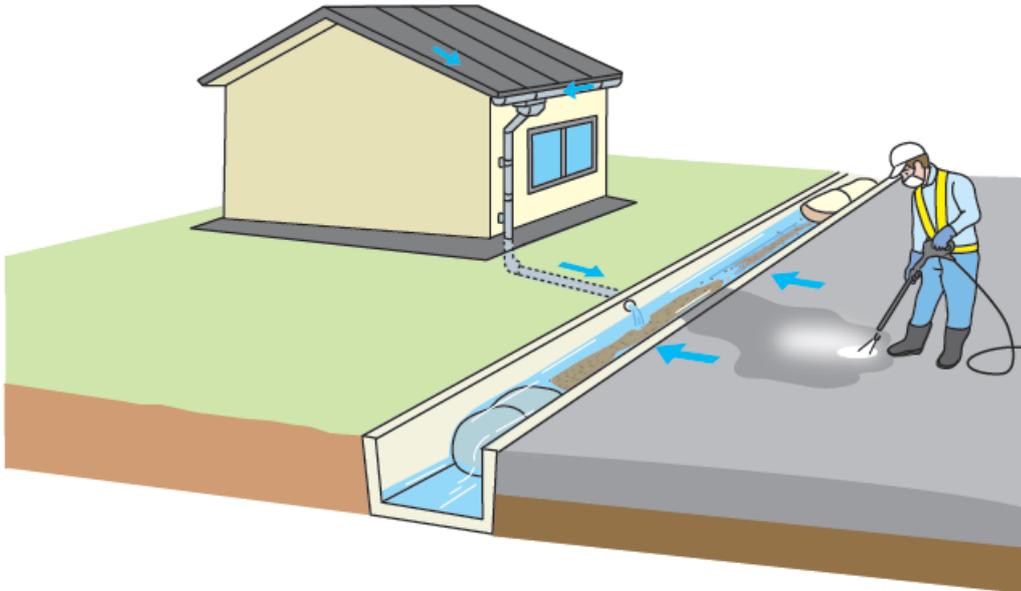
Example of wastewater treatment (sandbags installed in street drains)
